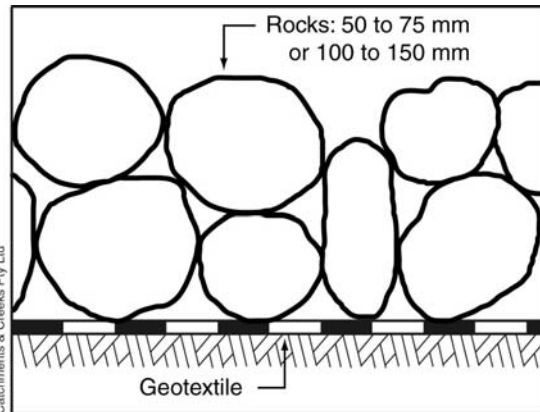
shows the typical layout of a rock pad suitable for construction sites. Guidelines on the design of entry/exit rock pads for small building sites are provided in the separate fact sheet for building sites (refer to *Miscellaneous* fact sheets).
